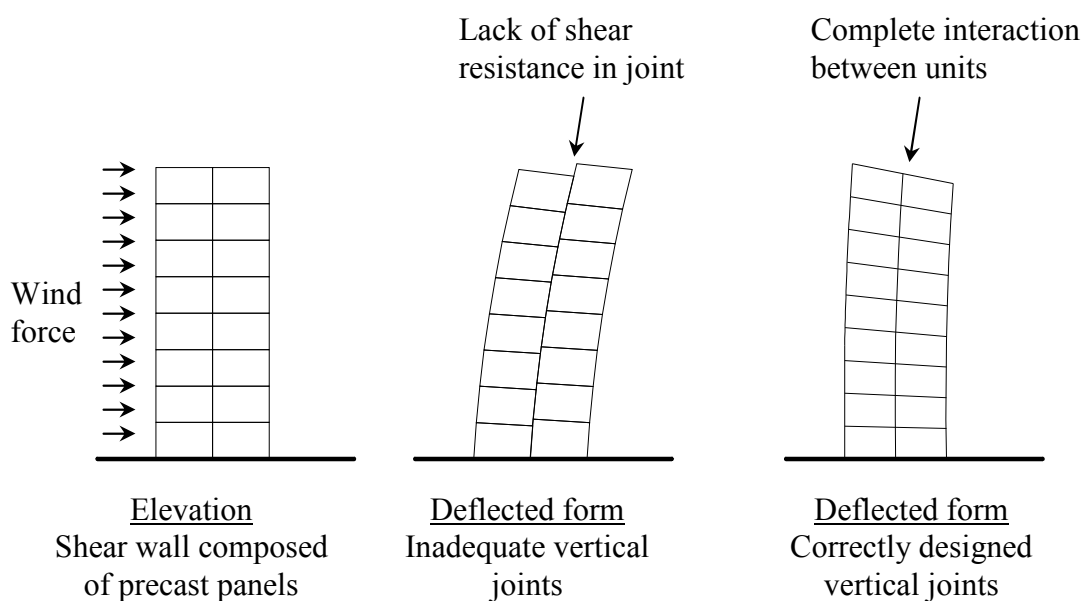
Joint performance of shear wall (Hartland, 1975)
